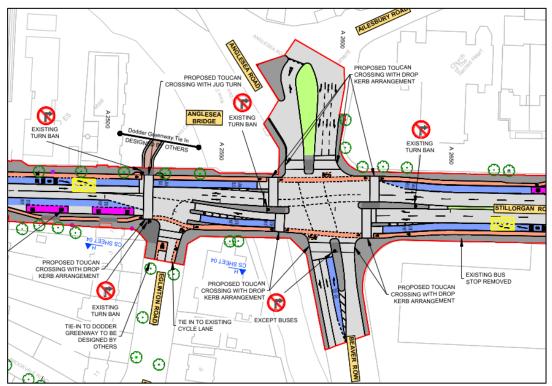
Extract from General Arrangement Drawings Beaver Row/ Anglesea Road/ Donnybrook Road Junction (Sheet 08)
